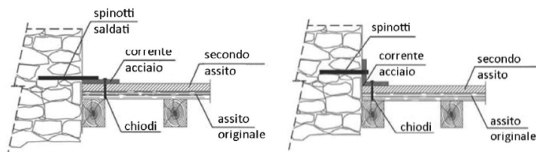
Diaphragm perimeter chords made of steel plates (a) or L-shaped profiles (b) [29]
